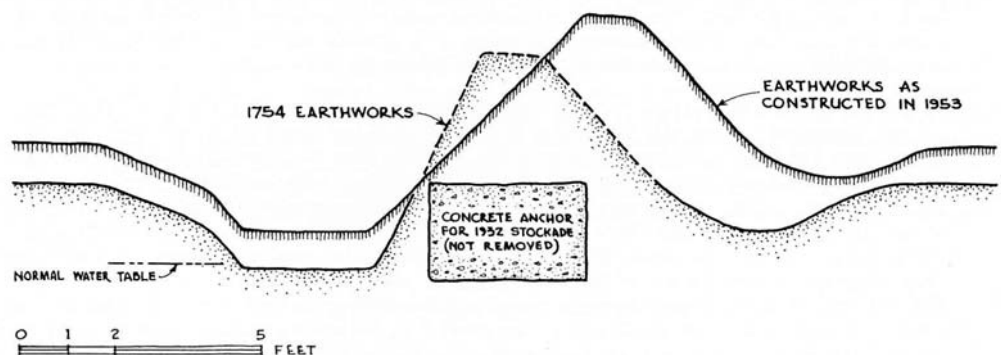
Cross-section (parapet conjectural) of 1754 earthworks and earthworks constructed in 1953.
